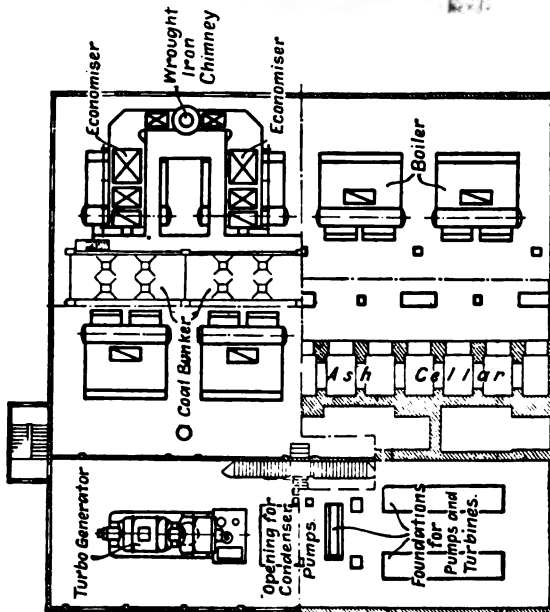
Brakpan Power Station. Plan of Engine Room and Boiler House. Scale, 1 to 500.
